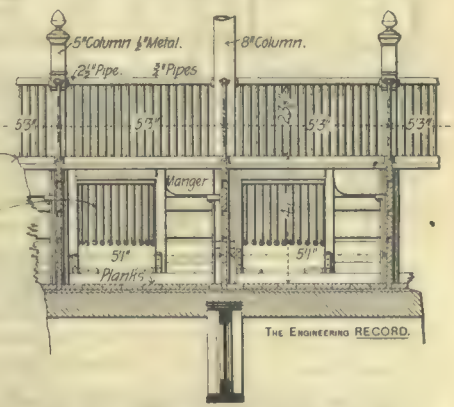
THE LONGITUDINAL ARRANGEMENT OF COLUMNS AND GIRDERS.
